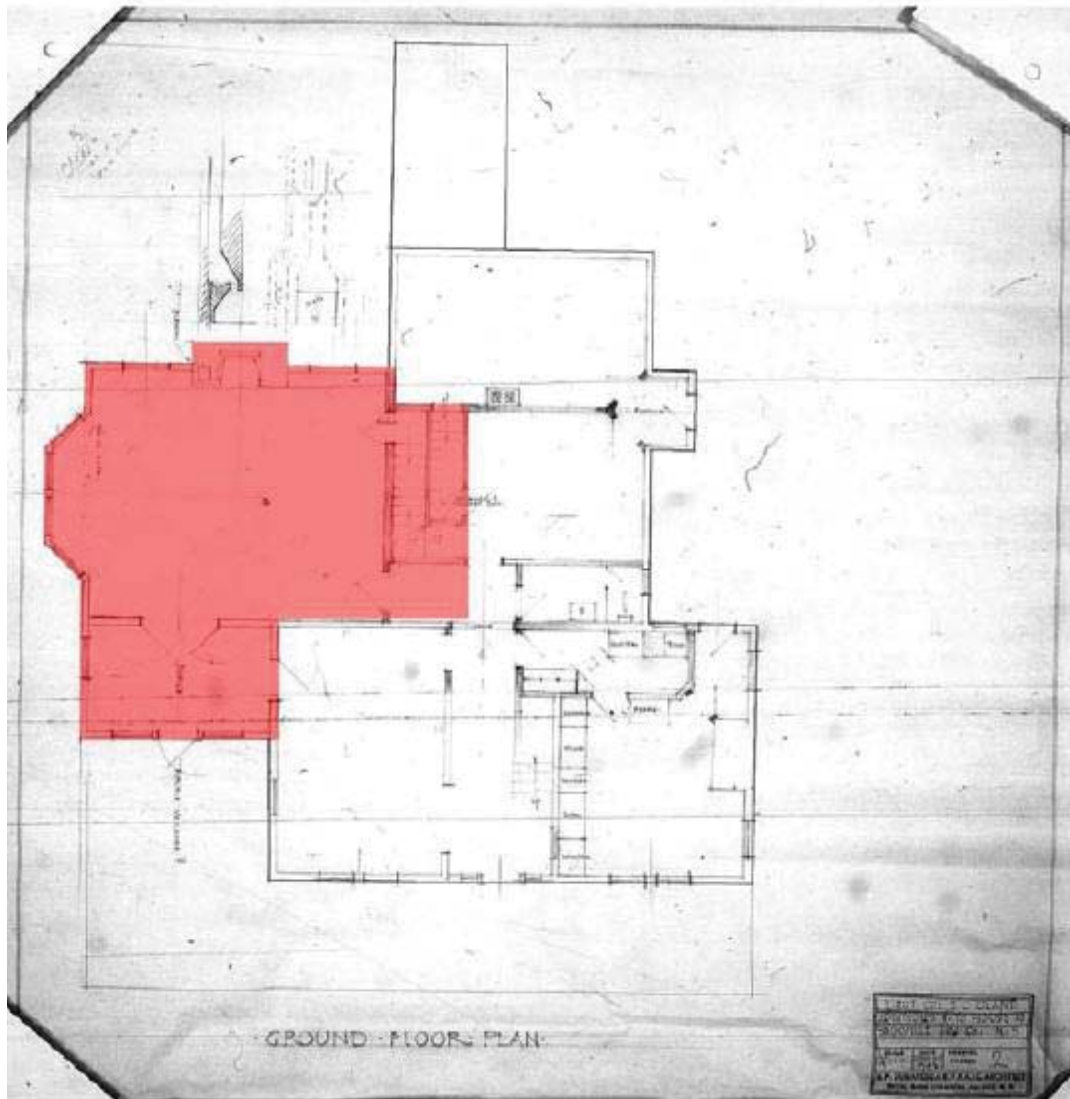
Ground floor plan, Lindwood House, 1942. Addition highlighted (Meggan Tanner, “Research Report,” Appendix R).
